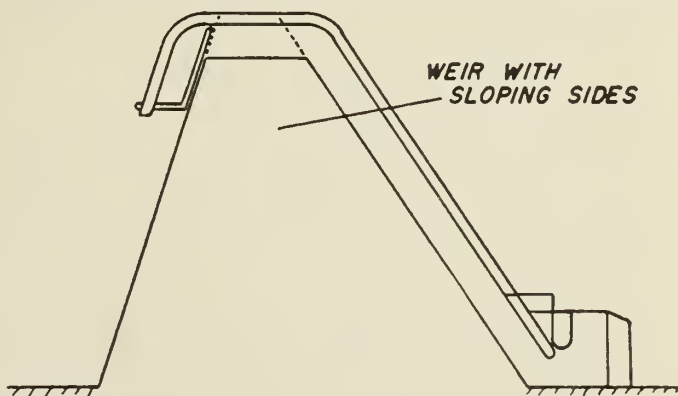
SIPHON INSTALLATION IN EXISTING SPILLWAY
